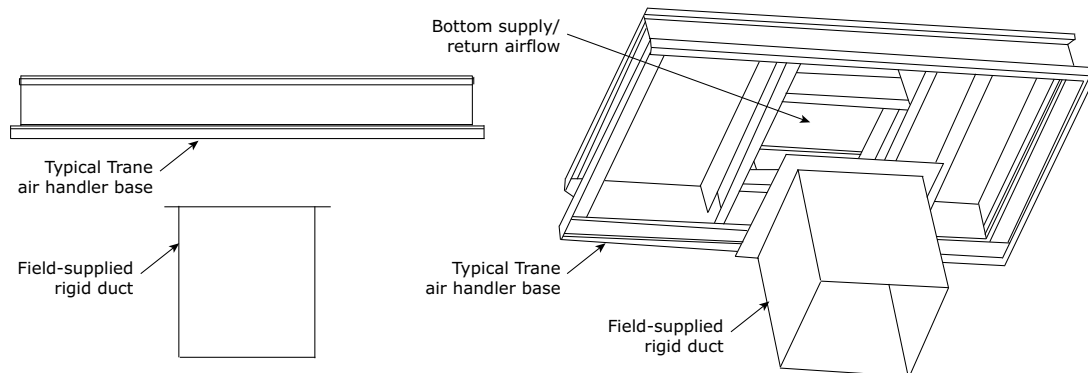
Field-supplied duct connection details - curb mount for outdoor units
